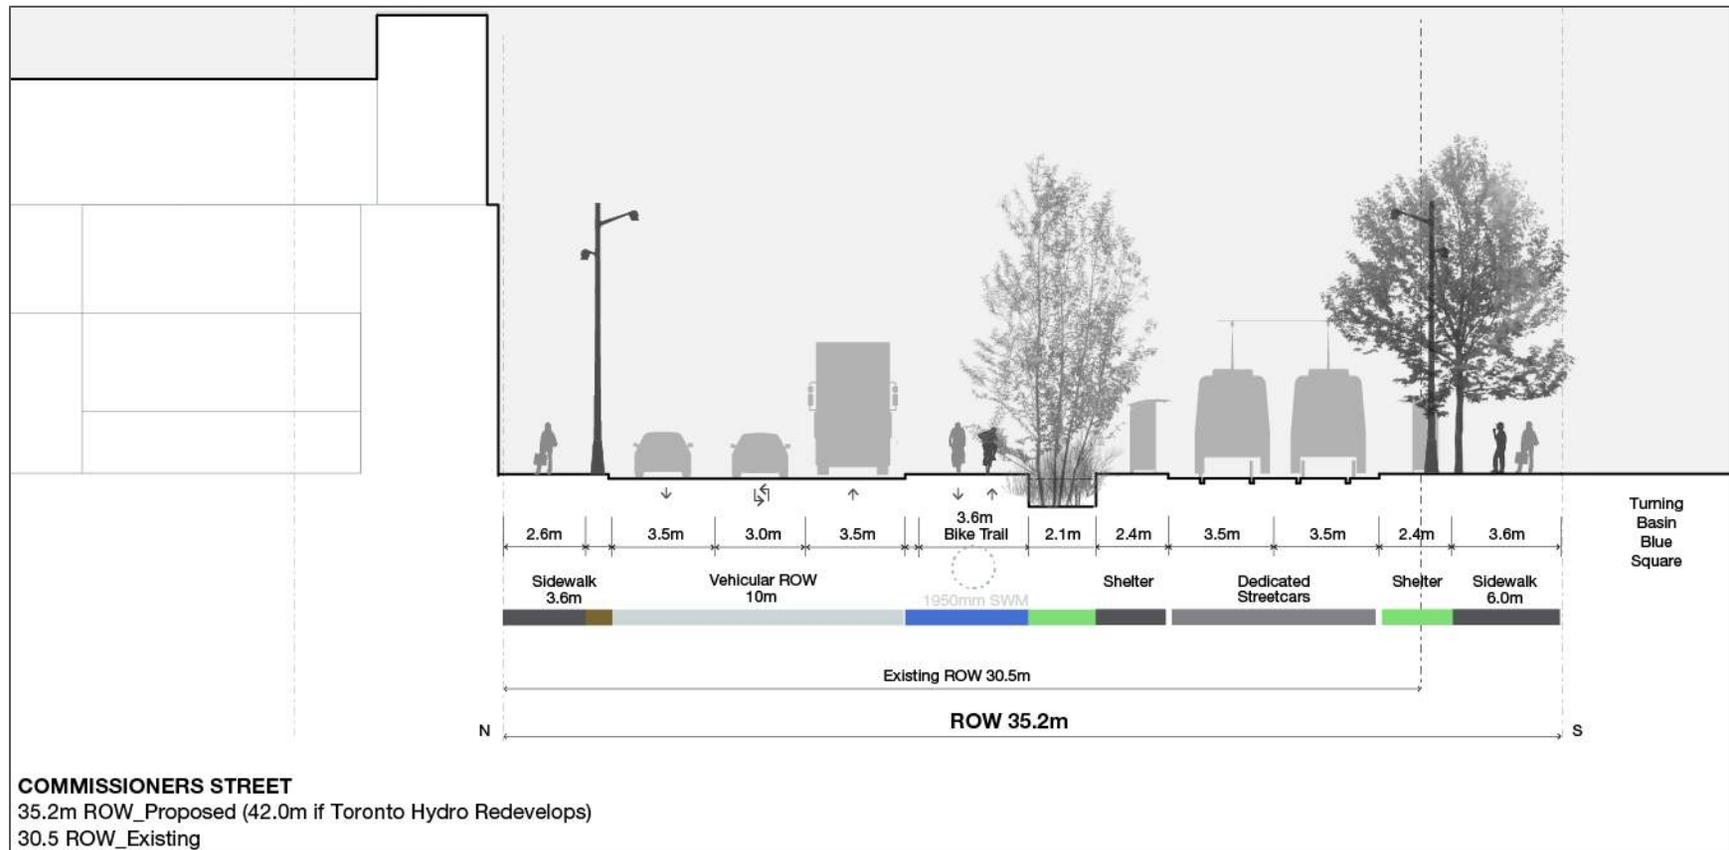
CONCEPTUAL CROSS-SECTION – COMMISSIONERS STREET, TURNING BASIN TO LESLIE STREET (CANADA POST)
